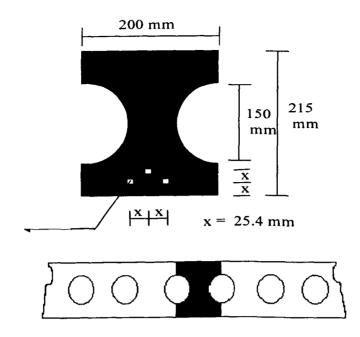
Typical hollow core slab units cross section and X-beam tests specimen.
